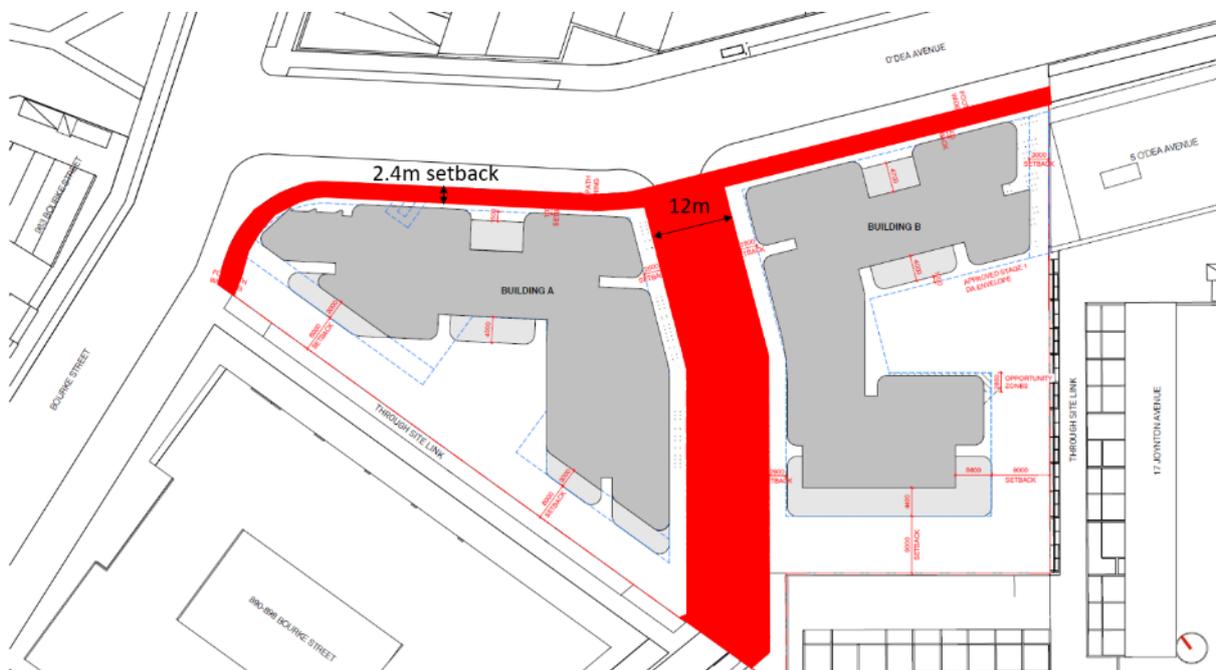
Site plan depicting land dedication for footpath widening and a new road within the site in red
